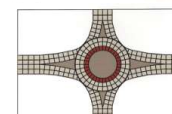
Joint Layout for Roundabout, Isolating Circle from Lanes
